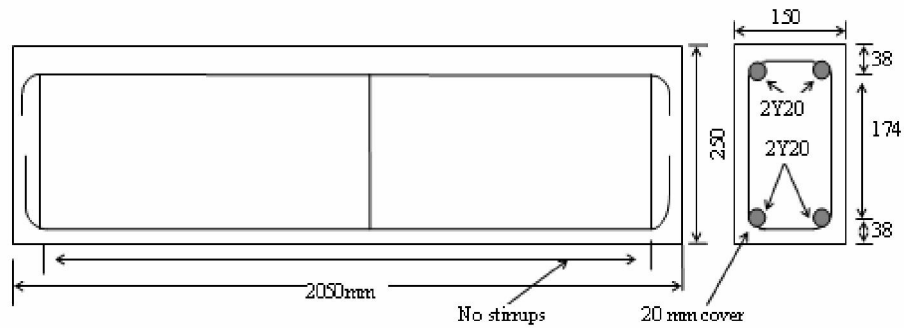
Details of reinforcement in specimen without shear reinforcement (NS)
